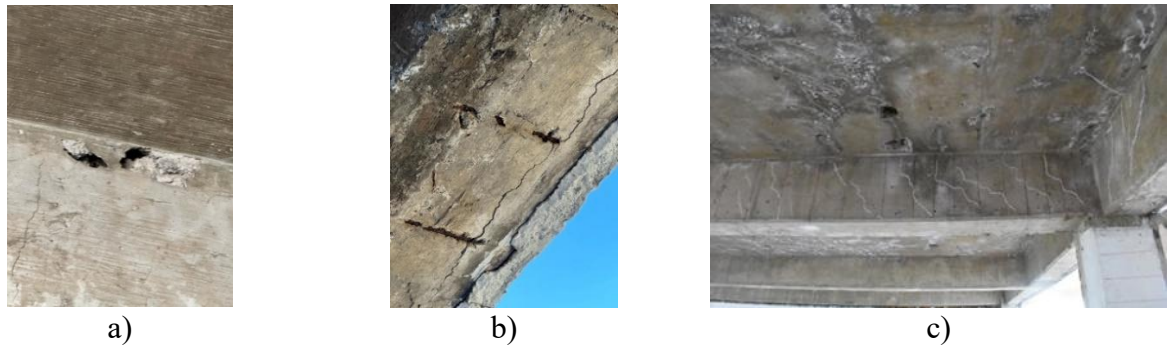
Damage and deterioration in the building; a) cracks and cavities in existing beams; b) corrosion in exposed reinforcing steel in secondary edge elements that do not provide lateral rigidity; c) presence of saltpeter and moisture in concrete slabs.
